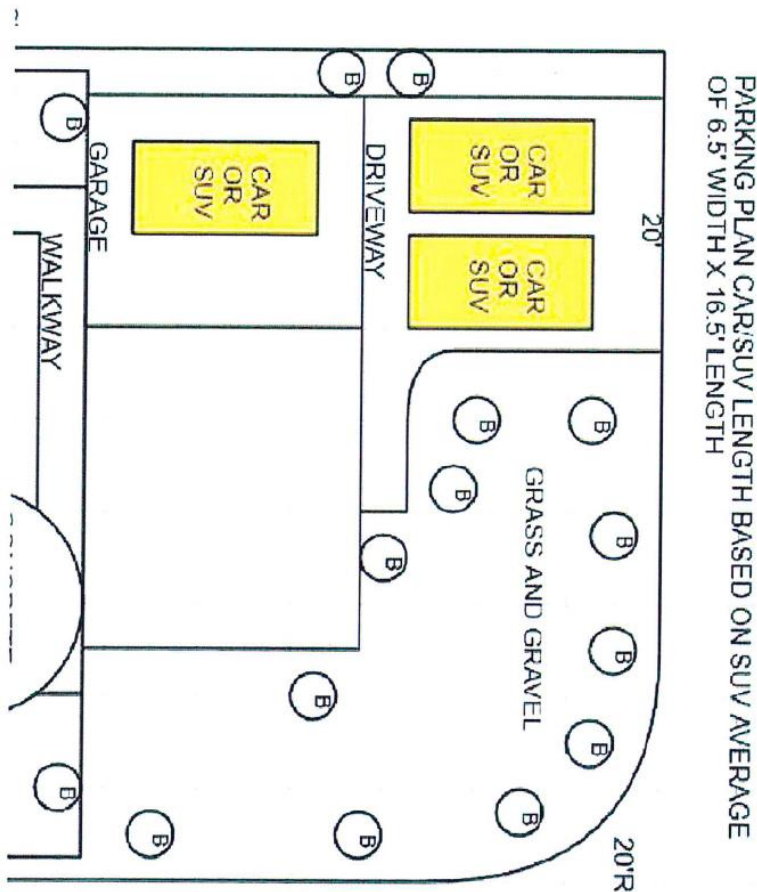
Applicant's parking site plan. Three off-street parking spaces are provided.
